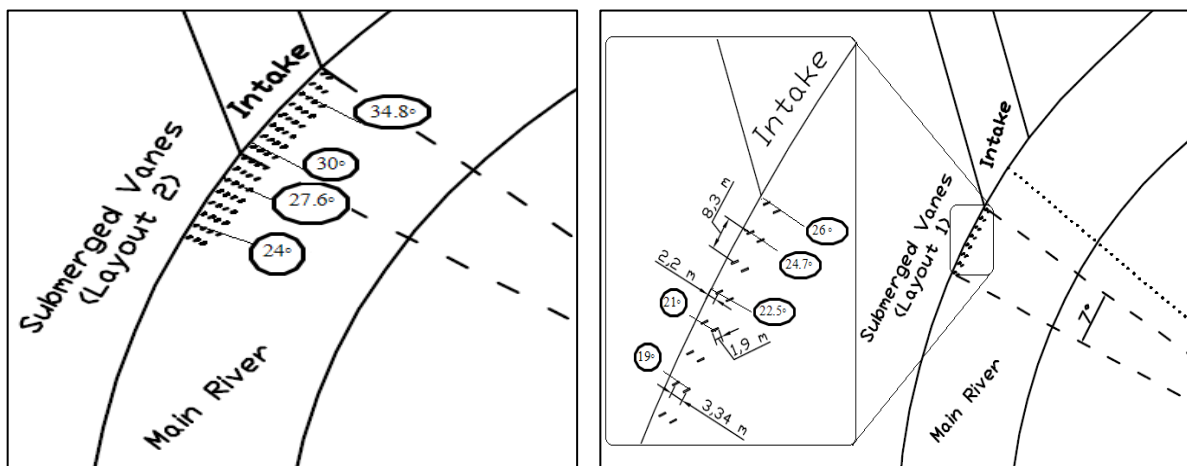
Schematic layout of Layout 1 and Layout 2 of submerged vanes
